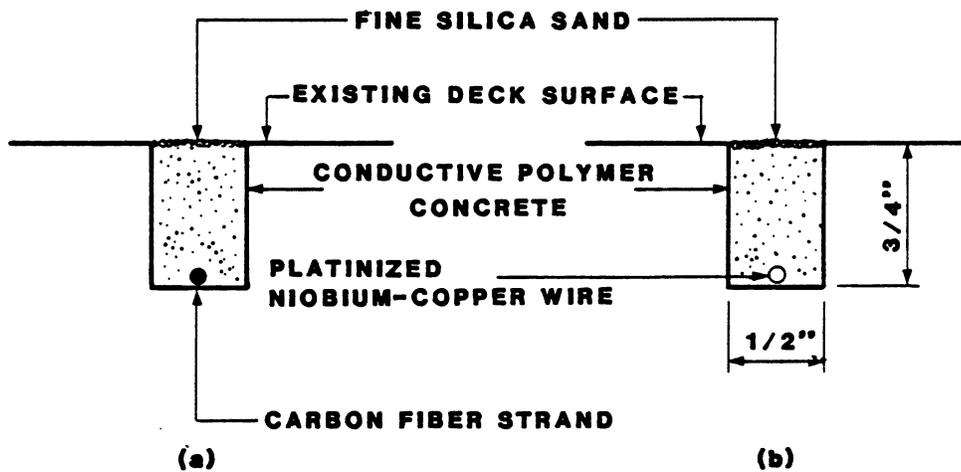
Cross-sectional views showing (a) transverse and (b) longitudinal slots.
